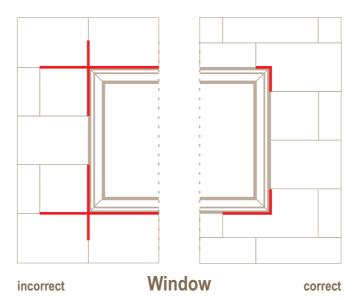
Proper arrangement of insulating panels near doors and windows
